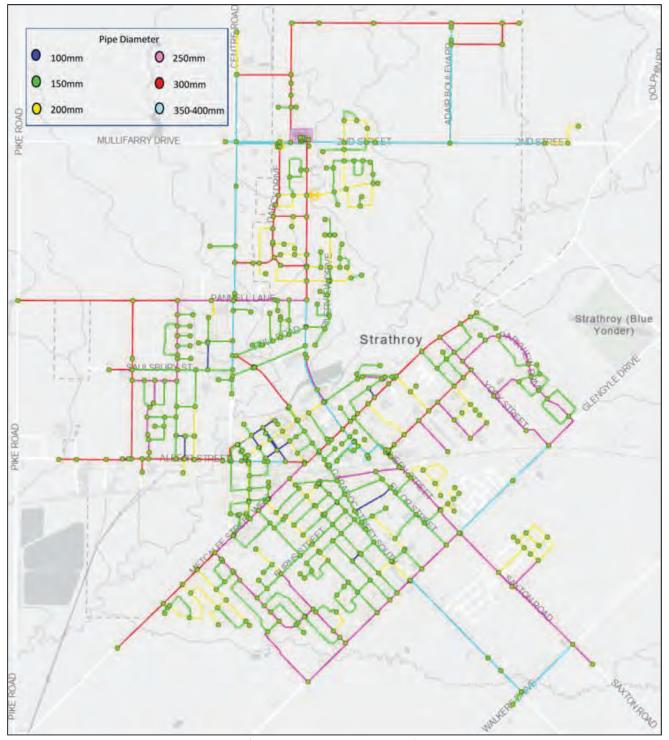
Proposed Watermain System Layout with Pipe Diameters
